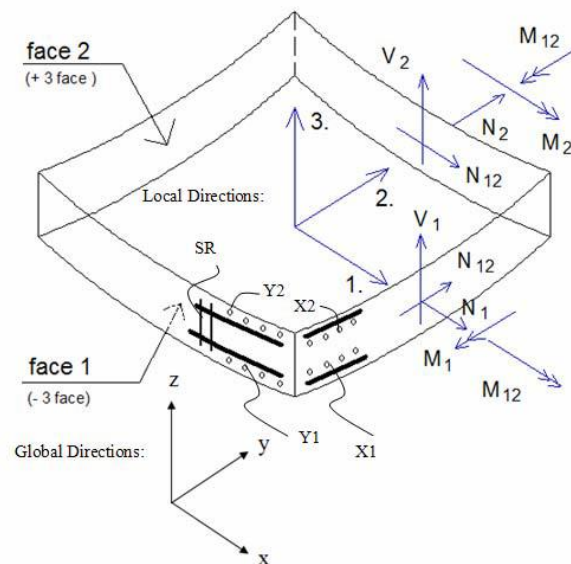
Section forces, faces and rebar definitions in ShellDesign (14).
